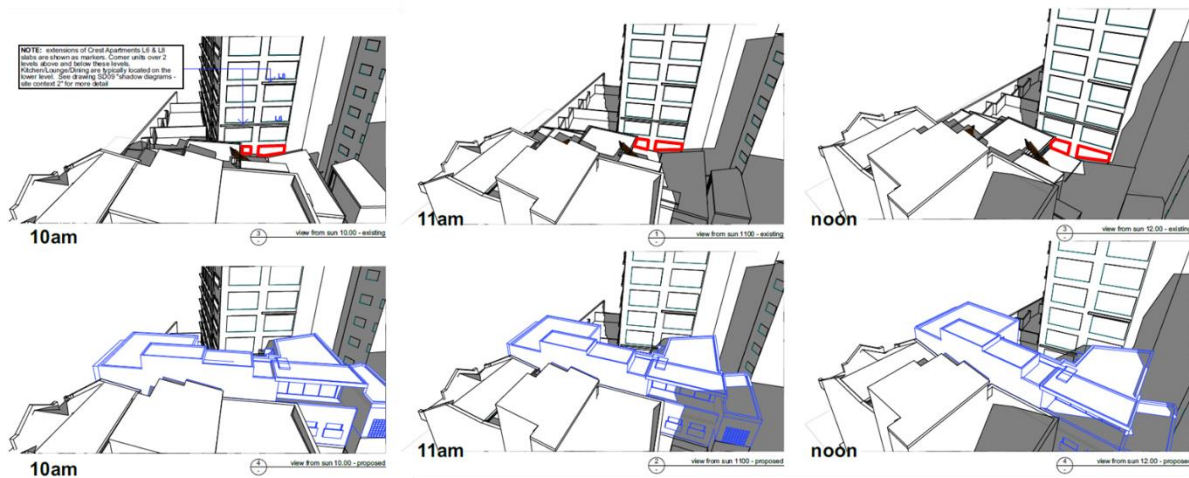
View from the sun diagrams demonstrating additional overshadowing impacts to the living room windows of Unit 4.12 within the Omnia building adjacent - highlighted in red
